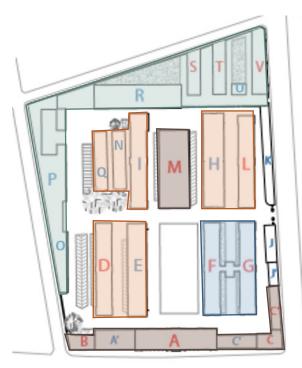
Nomenclature of the various buildings on the site ©sau-msi.brussels
